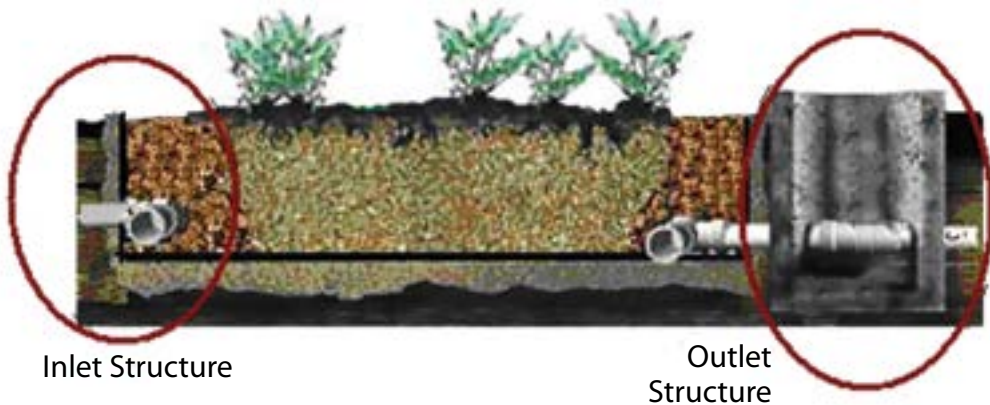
Incorrect positioning of the inlet and outlet pipes (Njau et al., 2010)
